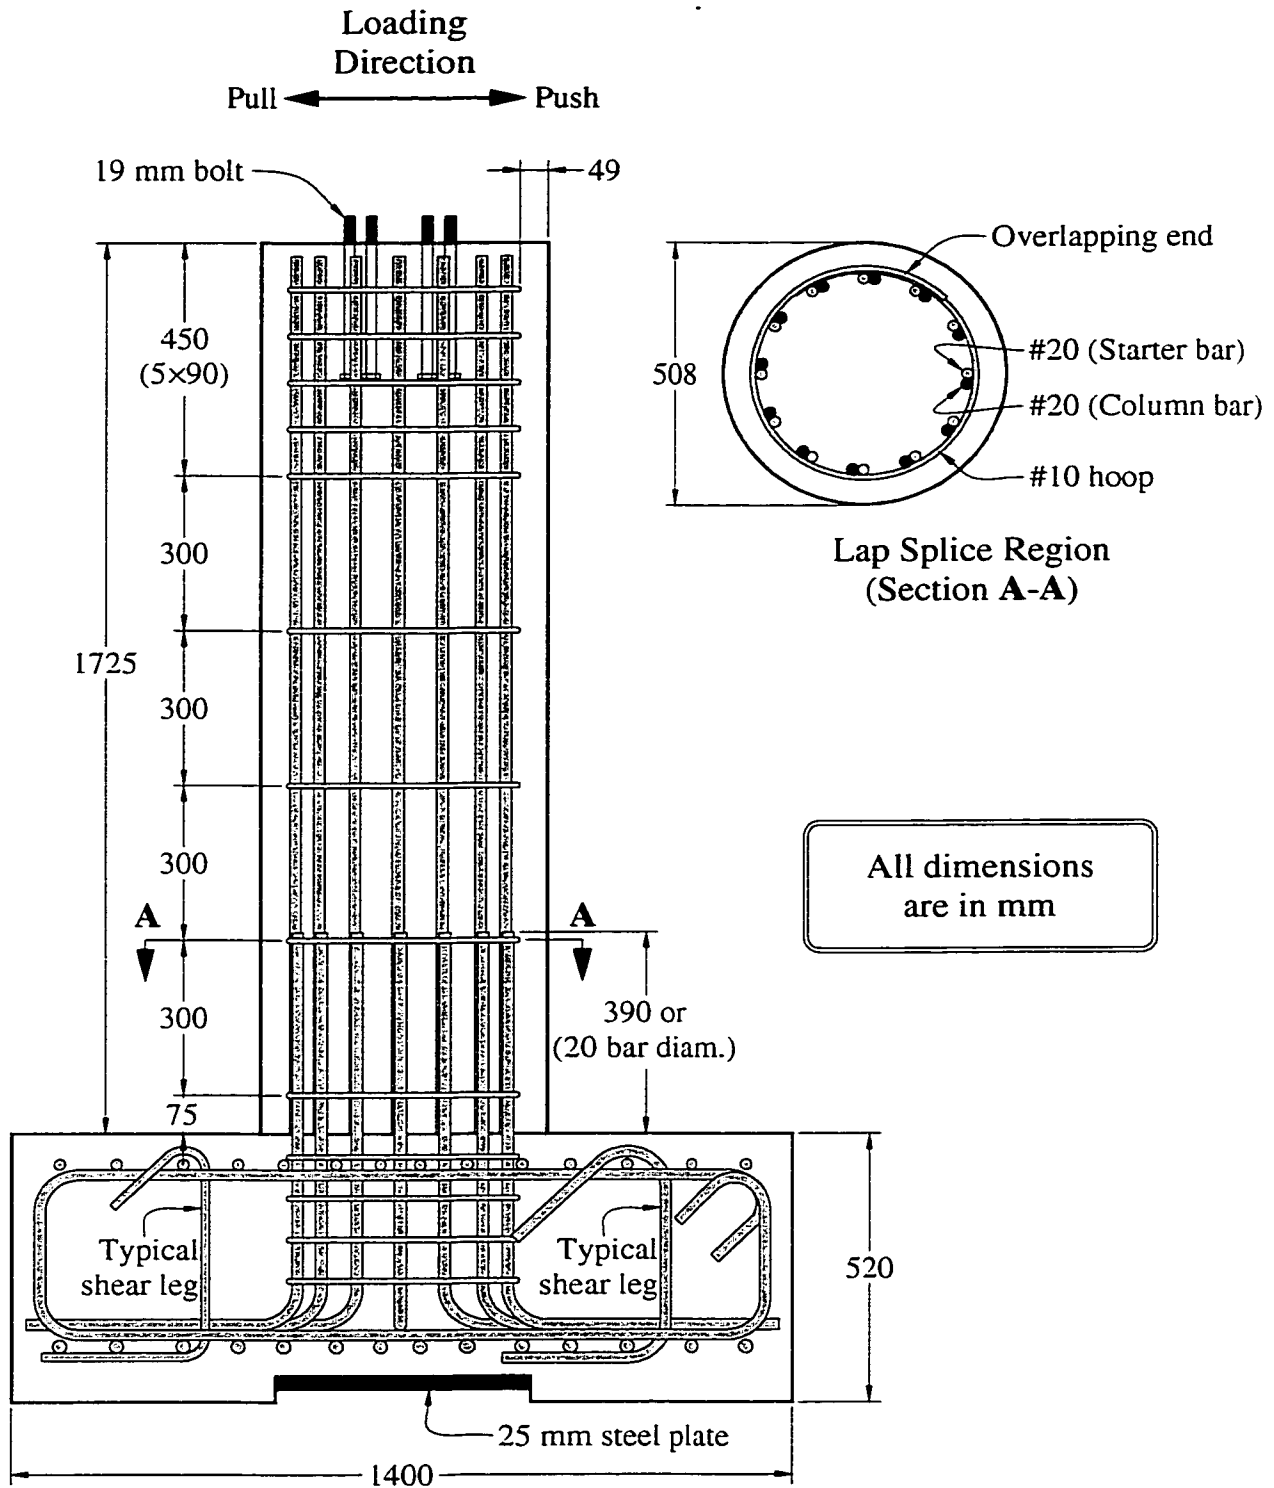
Dimensions and reinforcement details for columns BR-C8 and BR-C9
